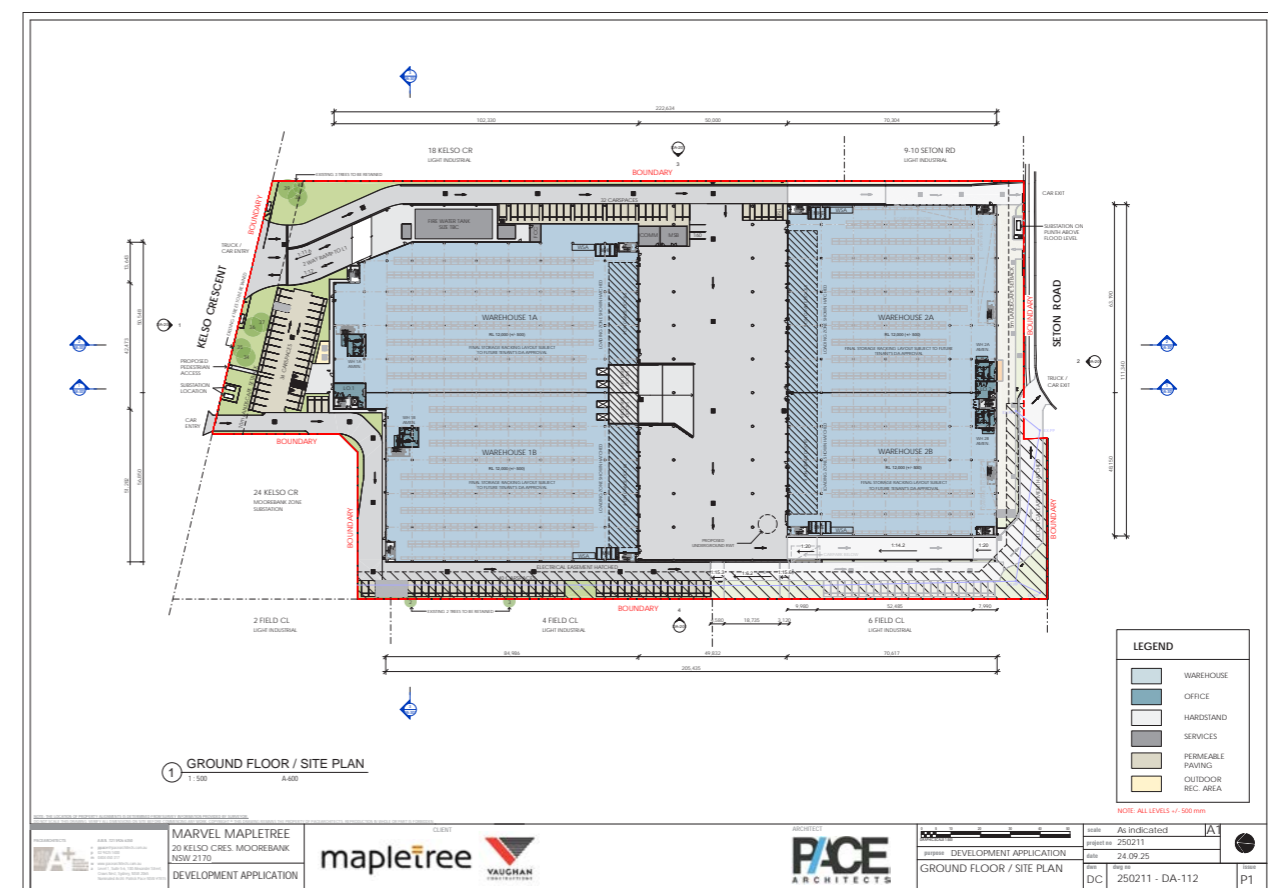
Ground Floor / Site Plan (Source: Pace Architects)
